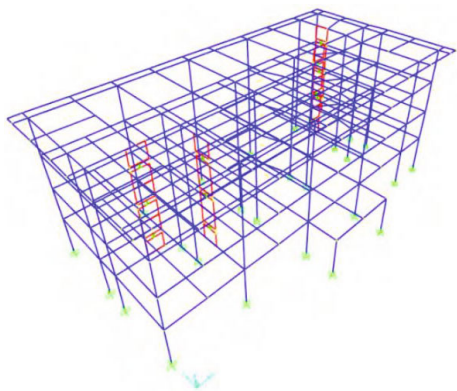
Model of a multistory dormitory building of an elementary school in Yunnan Province.
